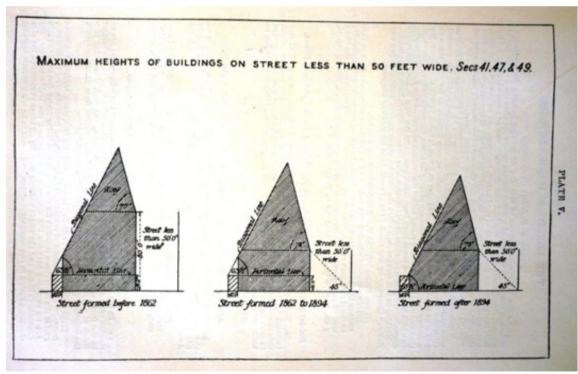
Maximum building height on street less than 50 feet wide (Ibid., Plate V)
